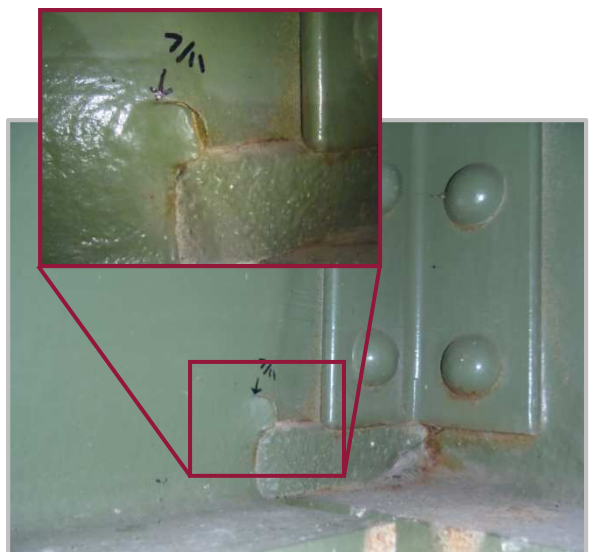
West end of Stringer 1 at connection to Floorbeam 24 with hooked crack in bottom flange cope. Note bow in stringer web at this location.
